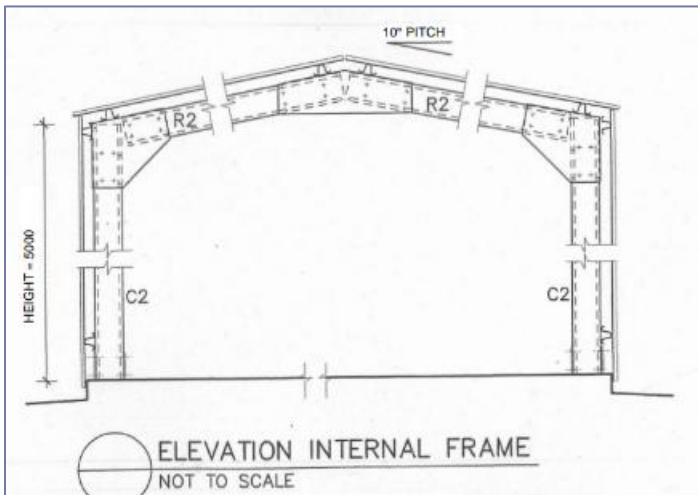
Shed Elevation (Extract from Approved Building Plans)
